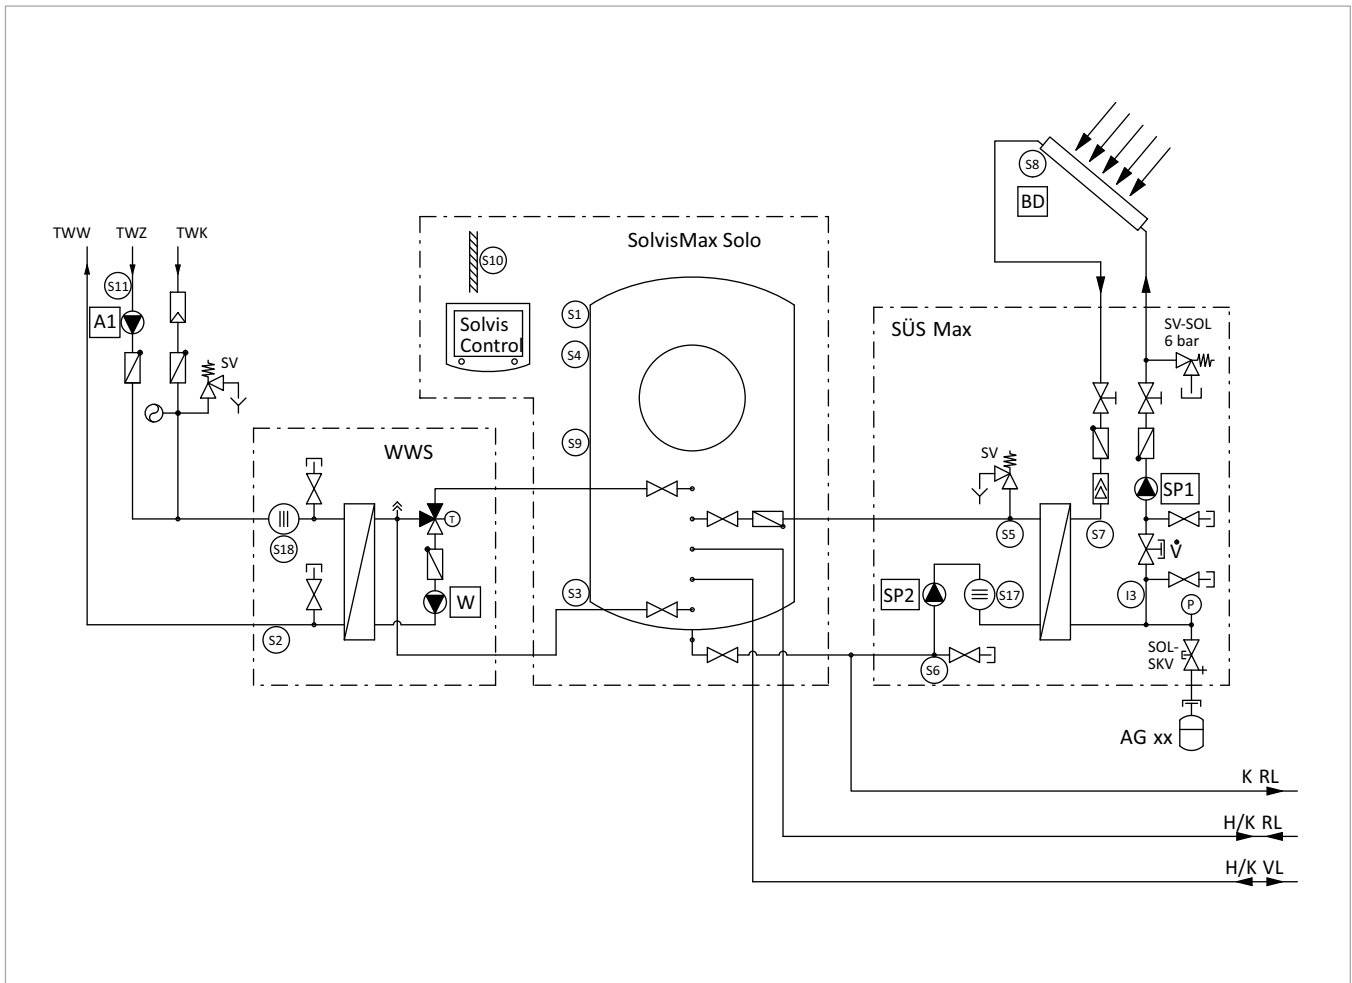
SolvisMax Solo with third-party boiler, solid fuel boiler, two mixed heating circuits – Part 1
